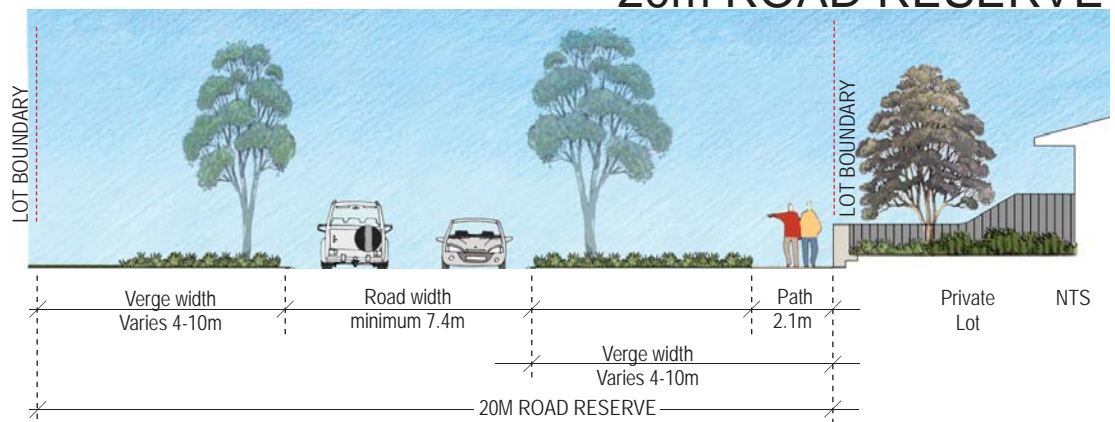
ROAD TYPOLOGY SECTIONS
